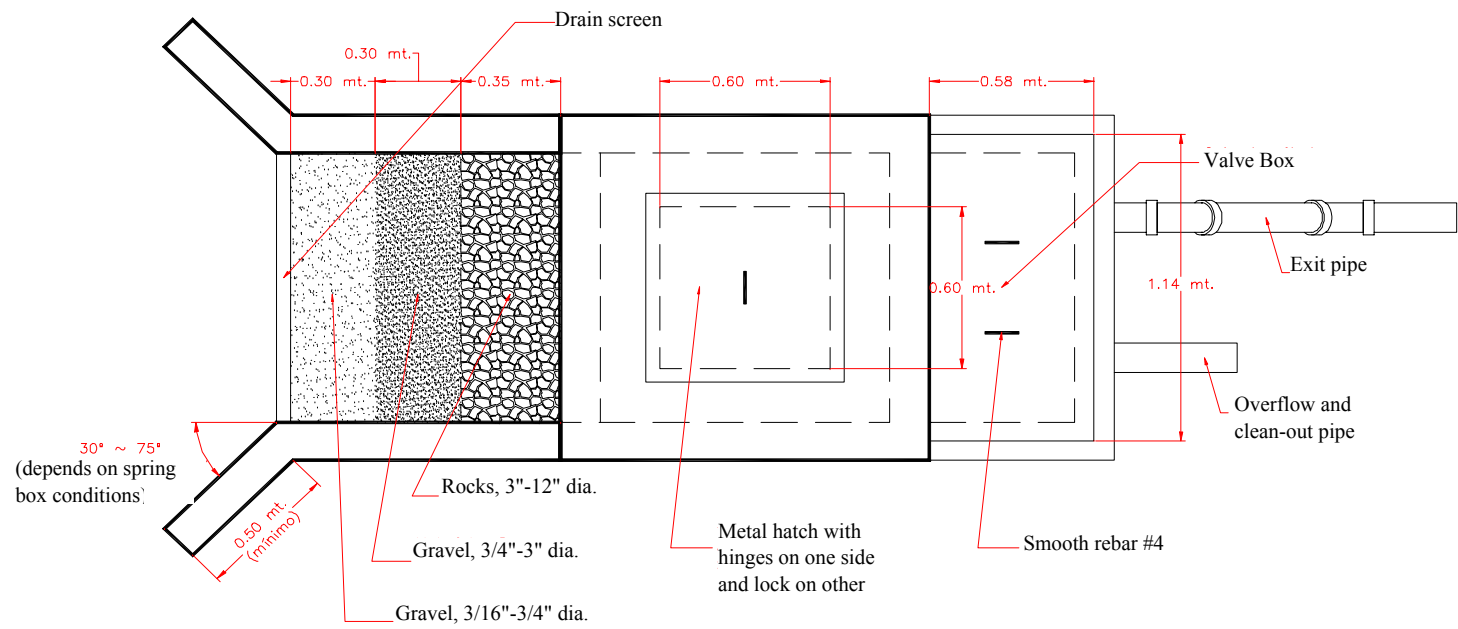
Plan view cross section of spring box with details of rebar arrangement and concrete
